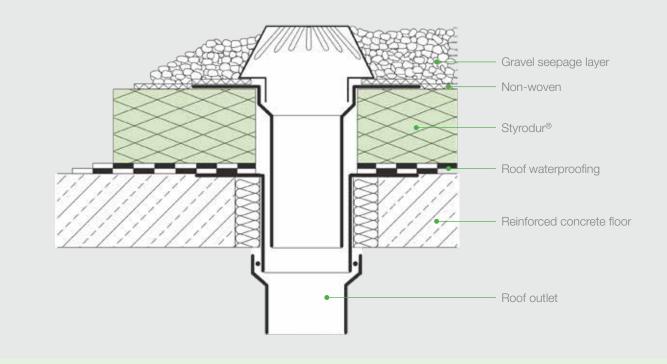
Roof outlet with two drainage levels for draining the roof above and below the insulation layer.
